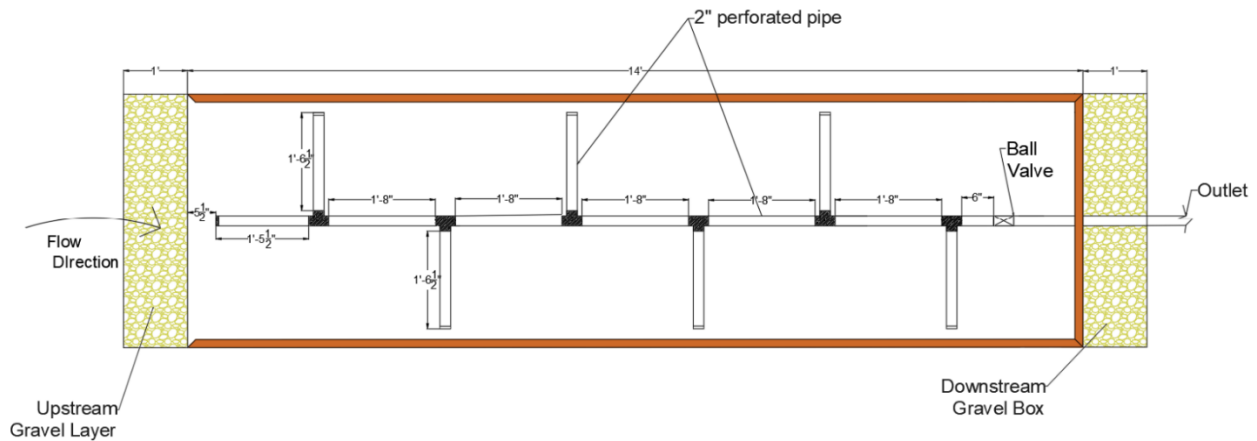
Layout of the underdrain system in the flume (plan view)
